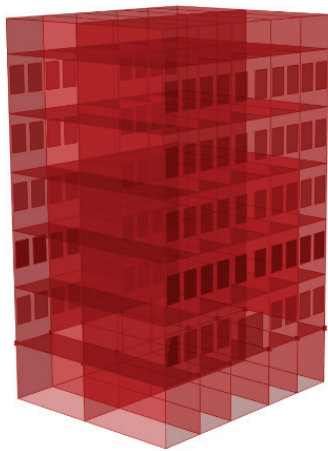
Parametric model of a building built before 1918 with a rectangular floor plan geometry (type 1).
